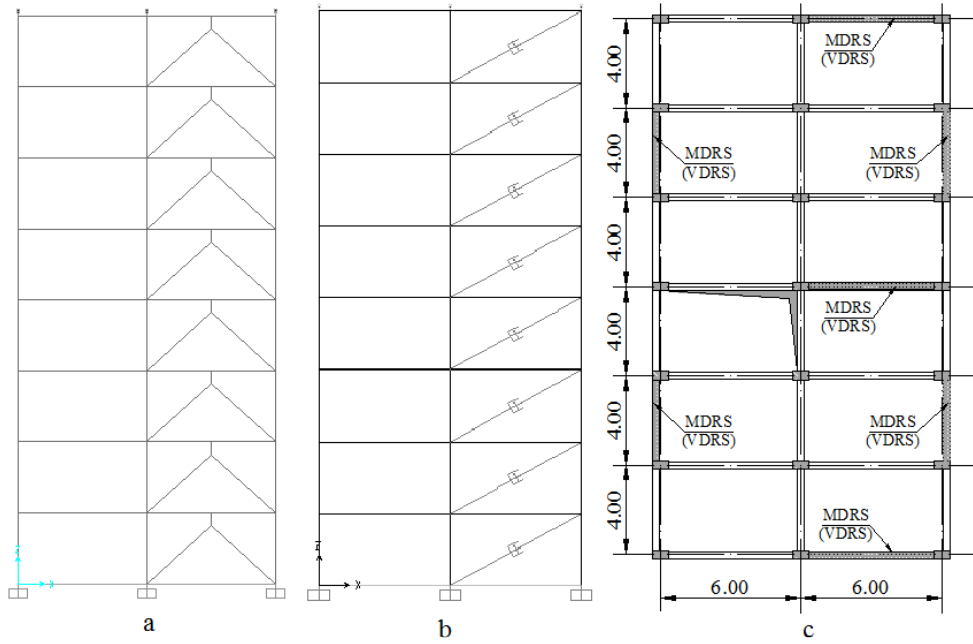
a. Elevation view for MDRS; b. Elevation view for VDRS; c. Placement of dampers.
